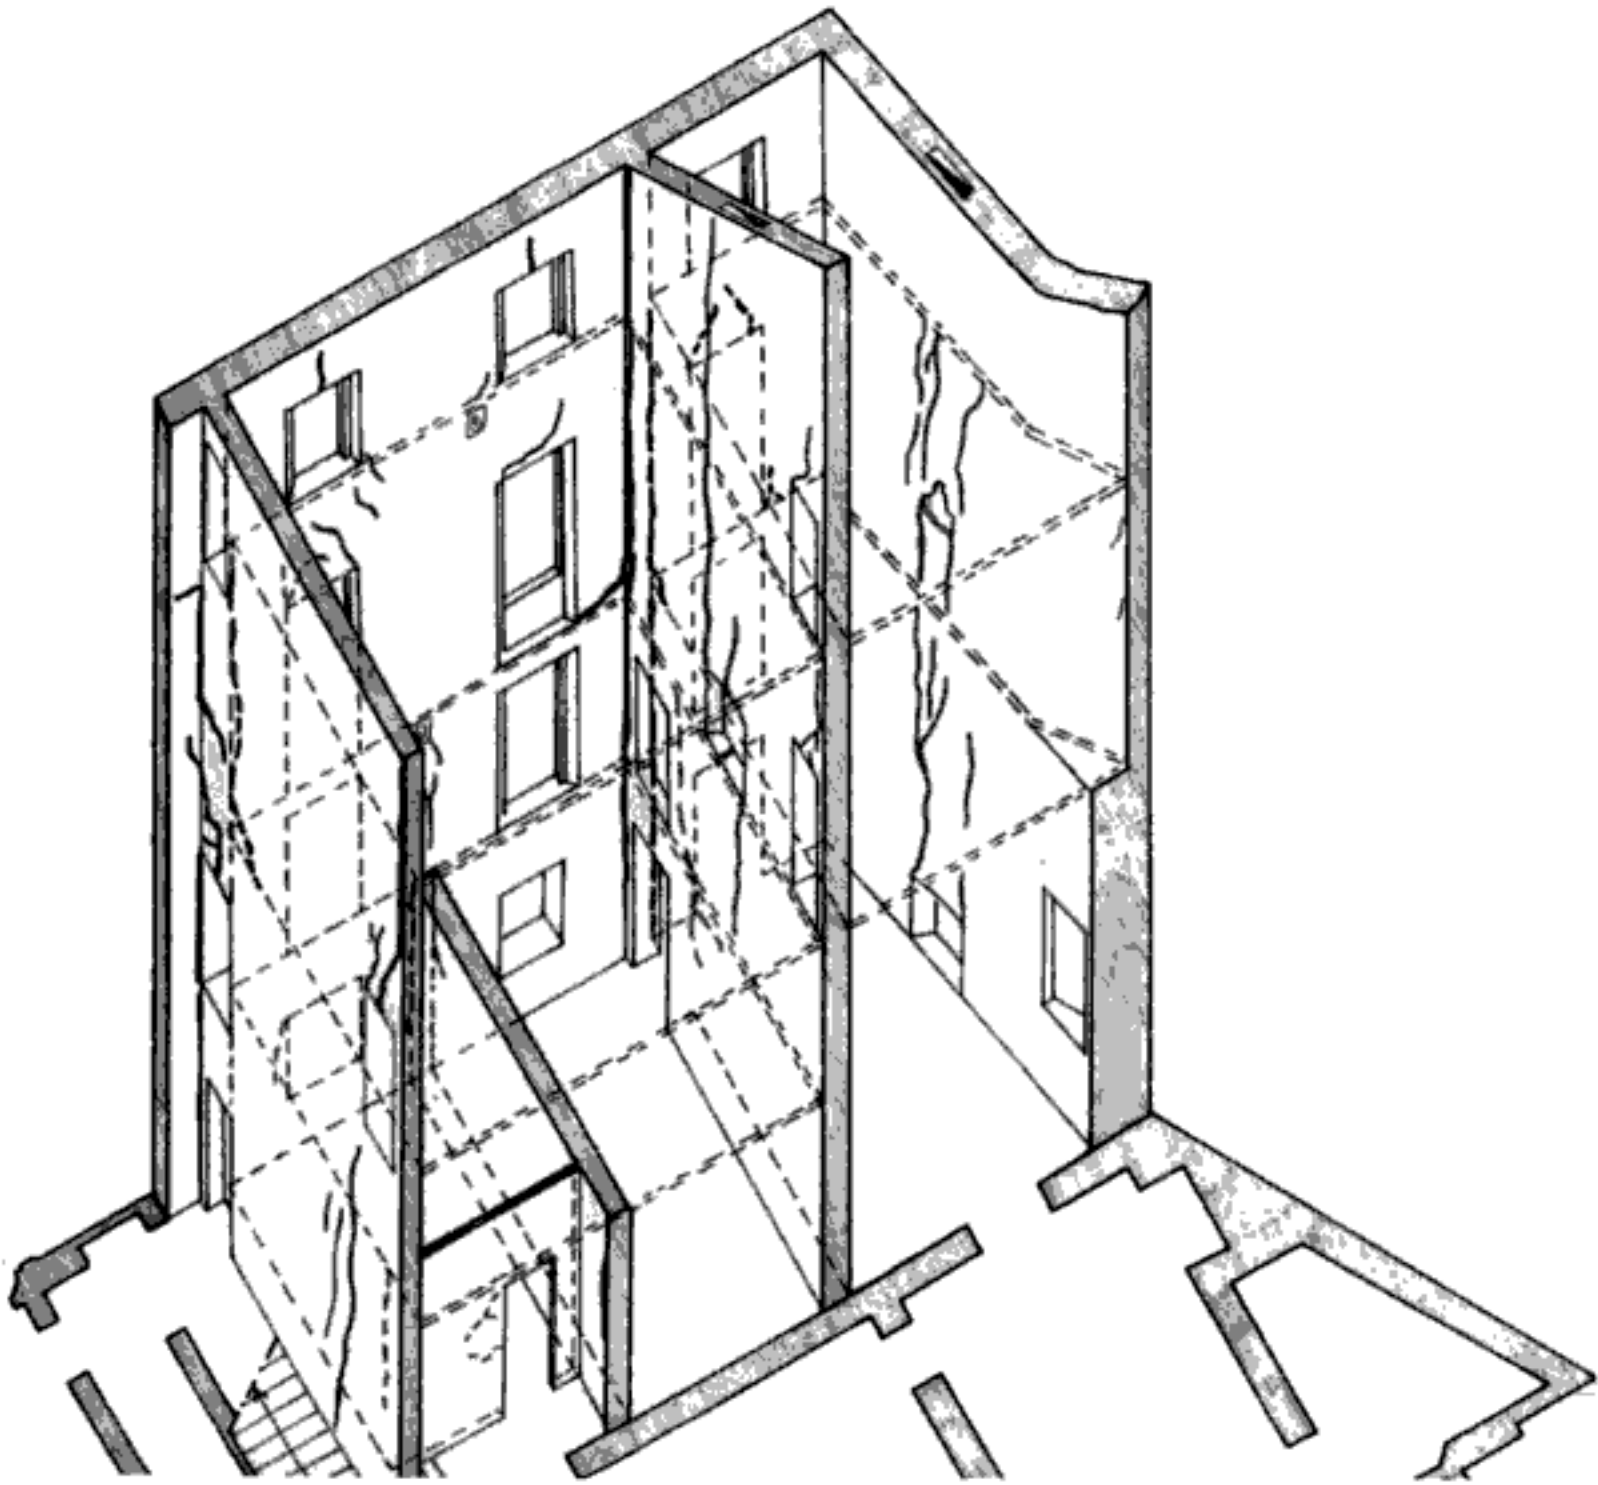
Detail of axonometric projection of the crack pattern with the crack running vertically the whole height between a transversal wall and the longitudinal North façade.
